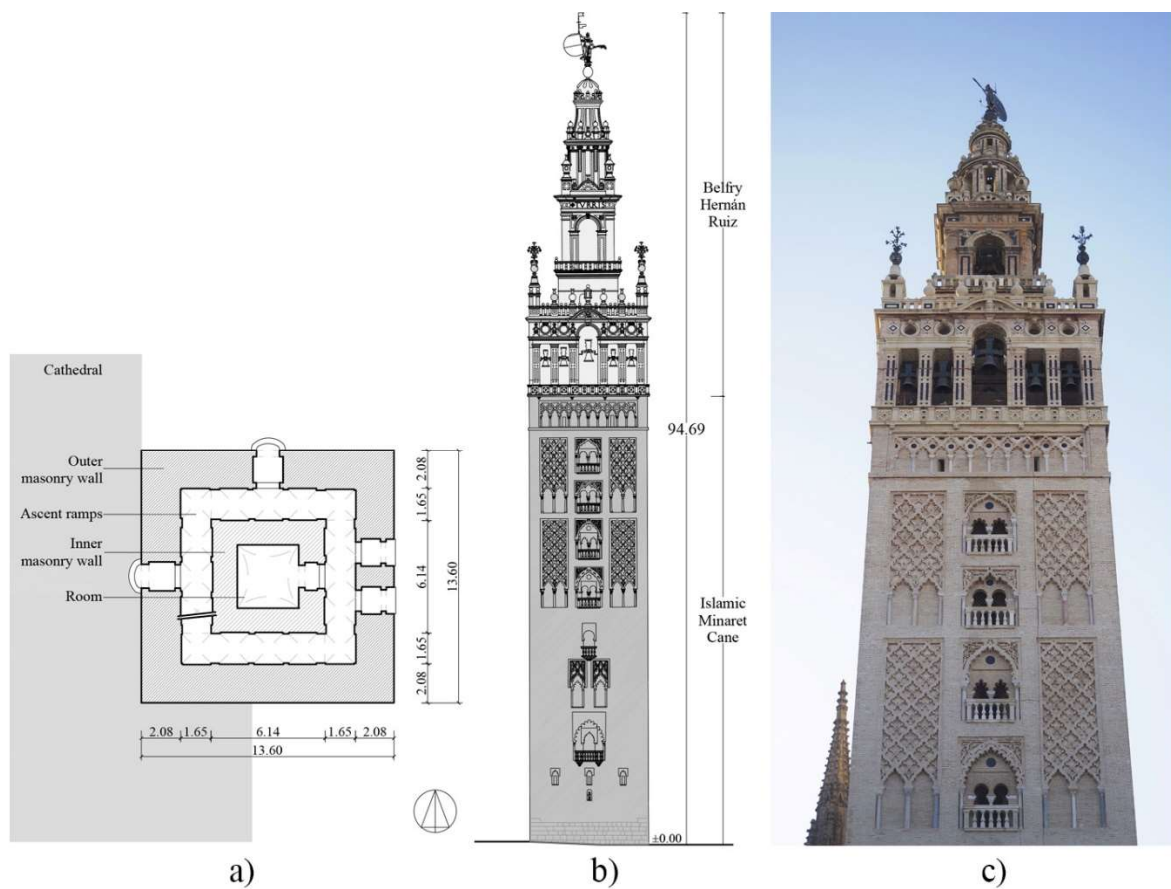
Schematic configuration of the Giralda tower. a) plan; b) west façade and c) current appearance.
